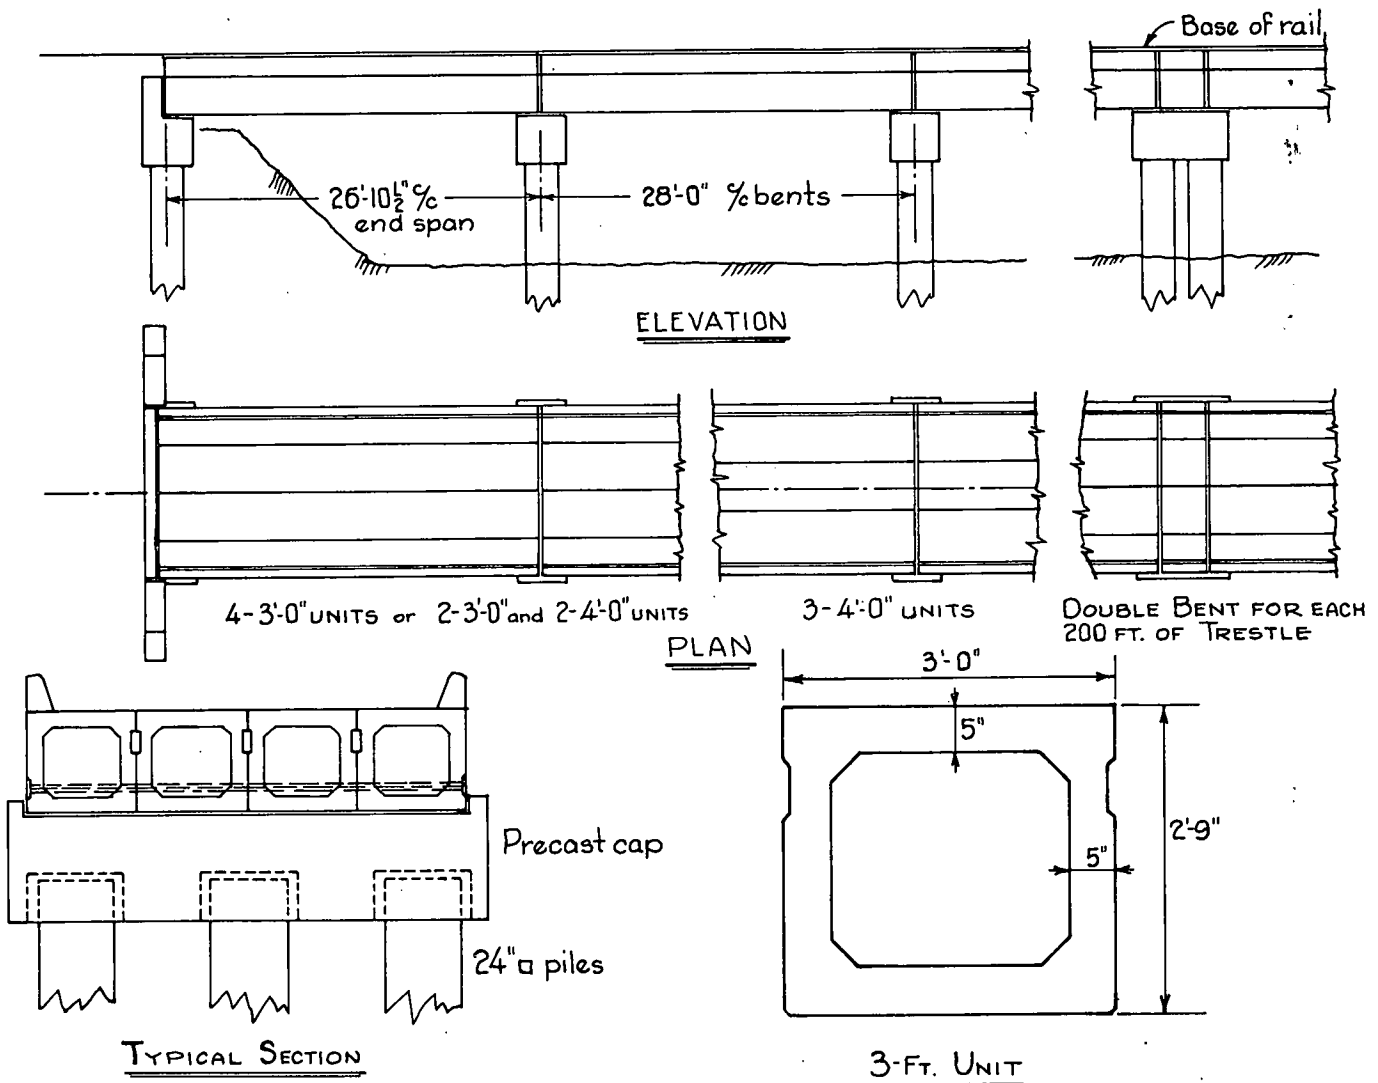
Precast prestressed concrete railway trestle (American Railway Engineering Assn.).
